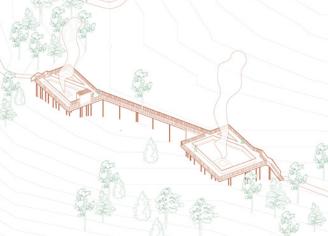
Elevated Boardwalk Over Vents Trail Isometric
